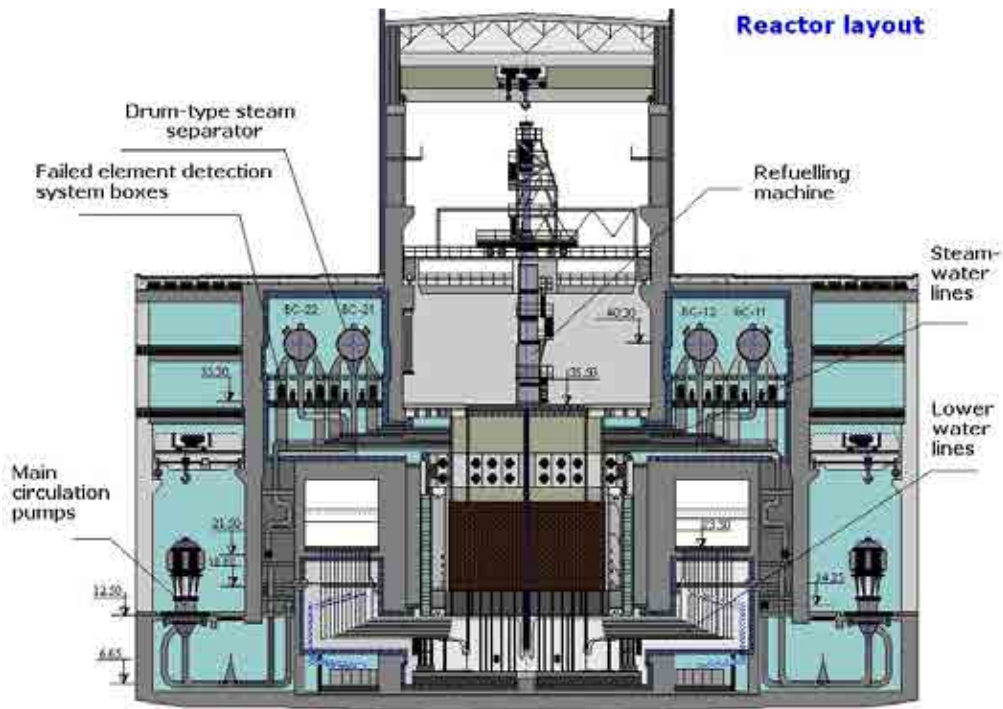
RBMK-1000 arrangement (adapted from Ref. [587]).
